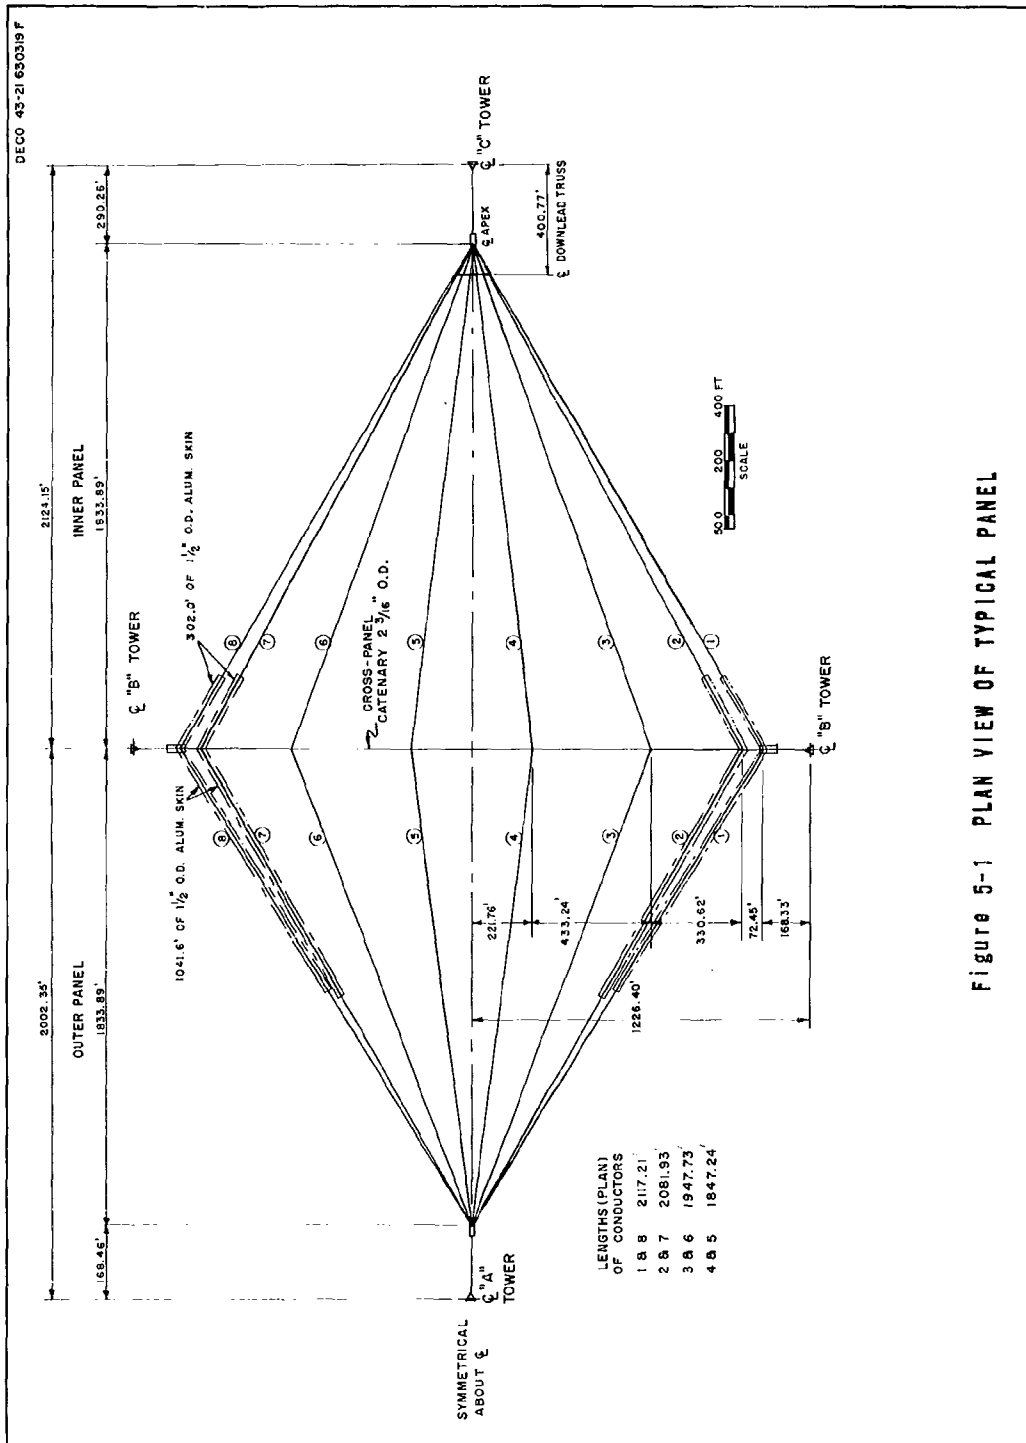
PLAN VIEW OF TYPICAL PANEL
